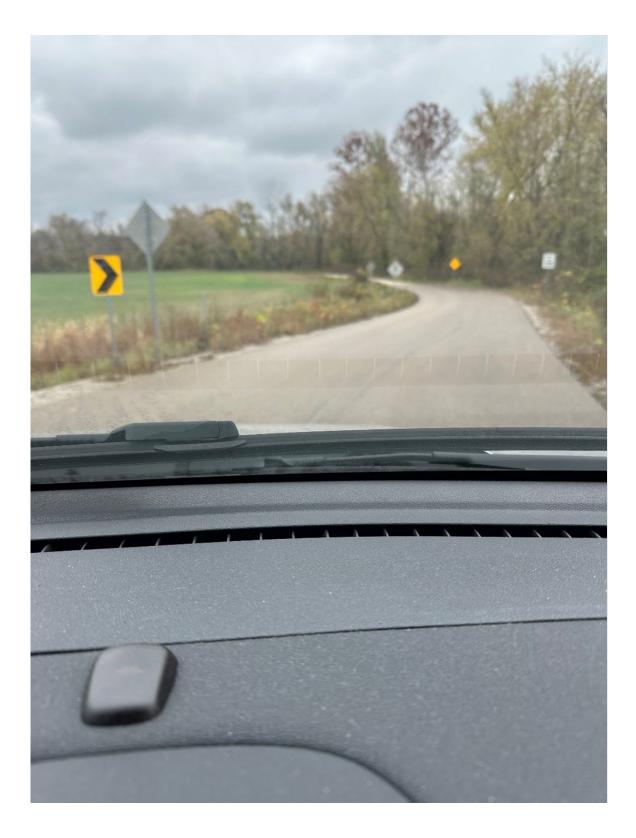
Traveling north along N Maple Grove Road from W Delap Road
